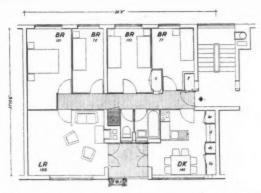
(above left). Ground floor plan of LCC's 4-storey maisonettes, type MA.A4. According to the survey reviewed here, tenants do not like this plan arrangement because the balcony is recessed into the living room and they like their living room to be "squared off." Fig. 2 (centre). Plan of LCC's staircase-access flat for use in 3-storey blocks, type SA.G5. This arrangement, which gives access from both living room and kitchen, seems to be popular with tenants. If they have to choose access from one or the other they prefer access from the kitchen. Window boxes are, on
